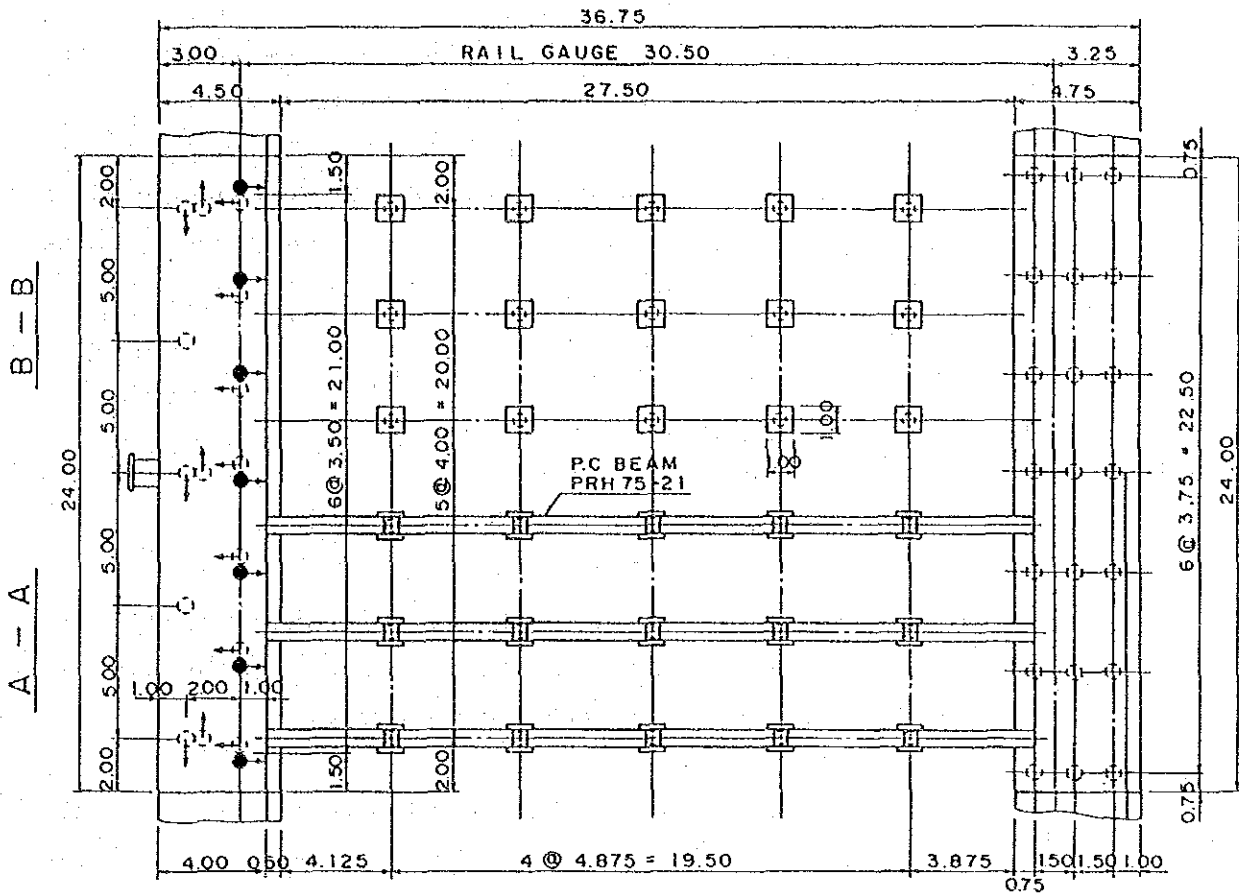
(a) Concrete Piled Deck type for JCT -13.5m Quay
